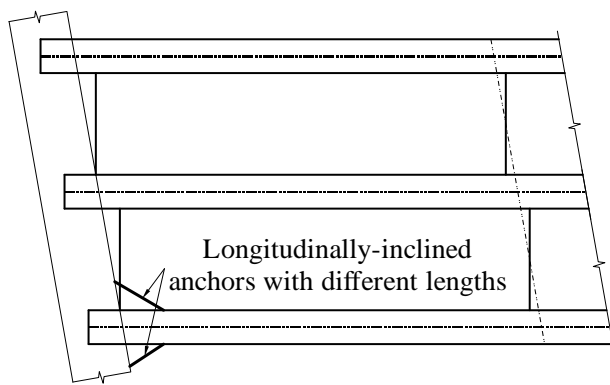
Longitudinally-inclined anchors on skewed bridges
